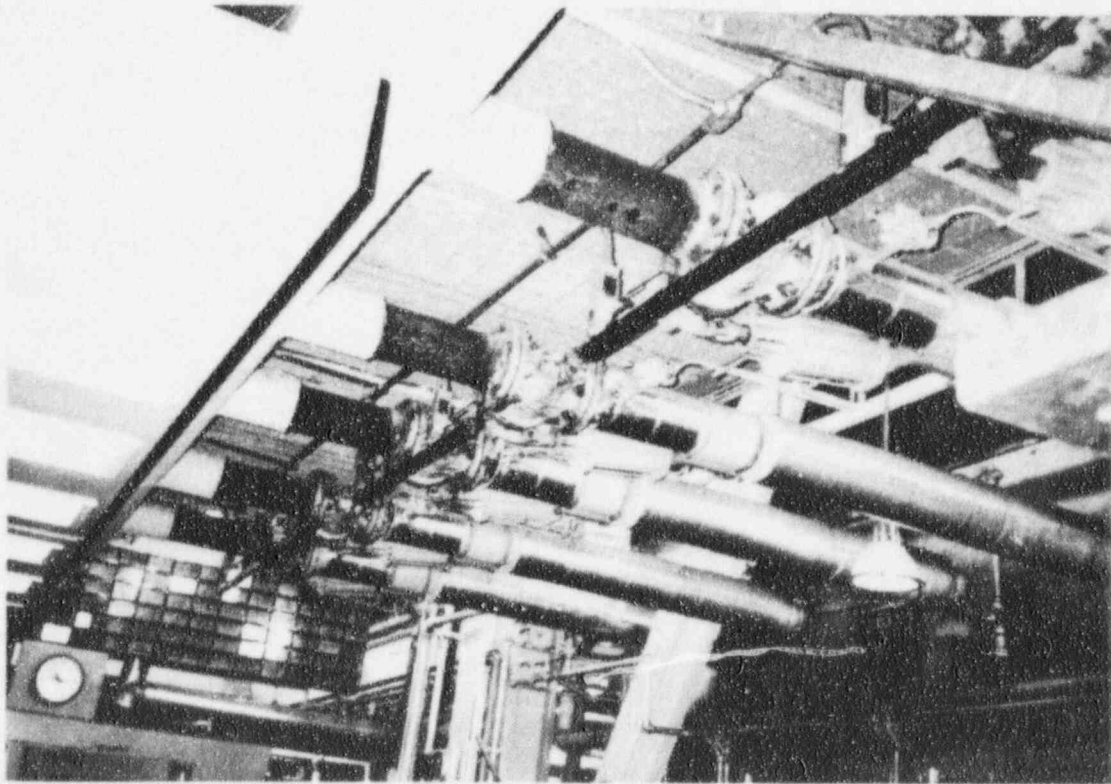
Snubber Support of Oil Feed Lines to Boiler on Humboldt Bay Unit 2
